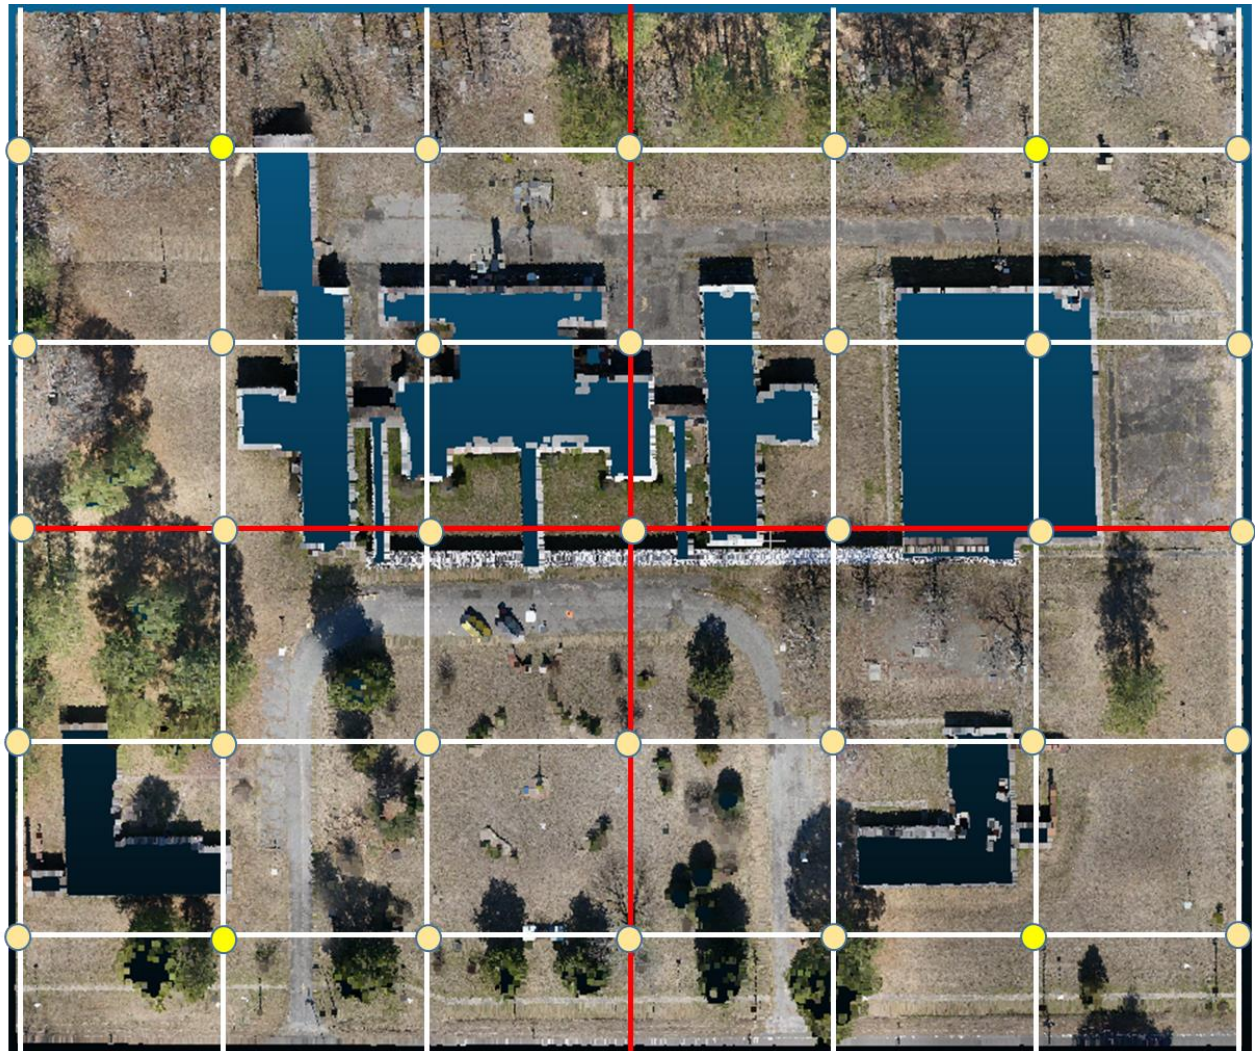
U2412-A Construction Site Point Cloud Segmentation
